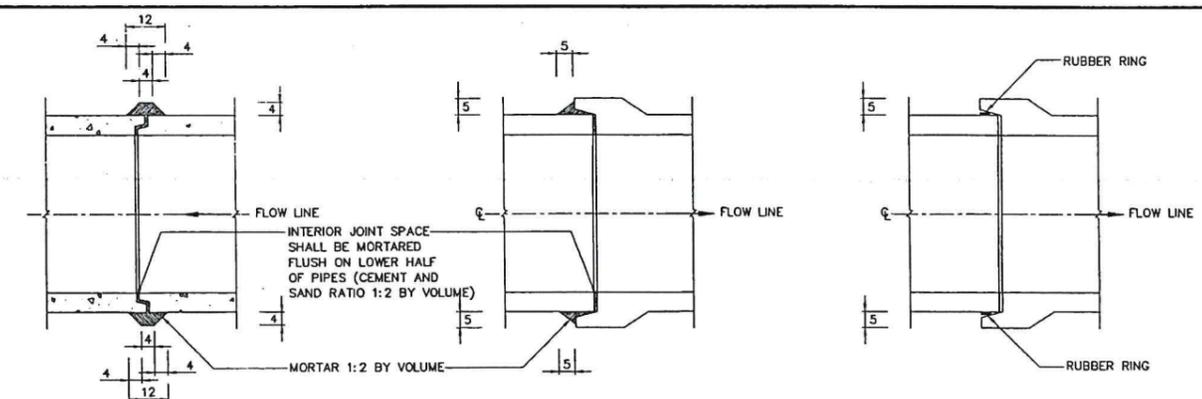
DETAIL OF R.C. PIPE CULVERT NOT TO SCALE
